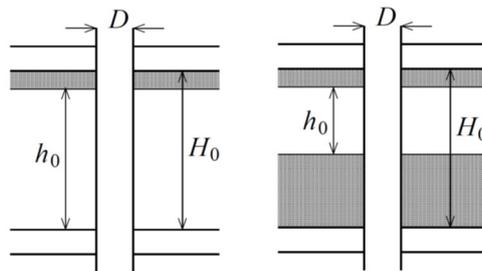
Effects of infill nonbearing wall to the structural frame
